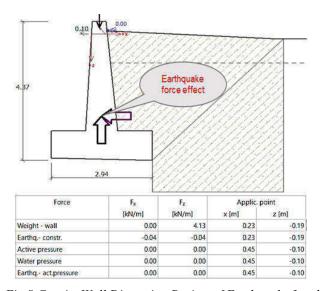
Gravity Wall Dimension Review of Earthquake Load
